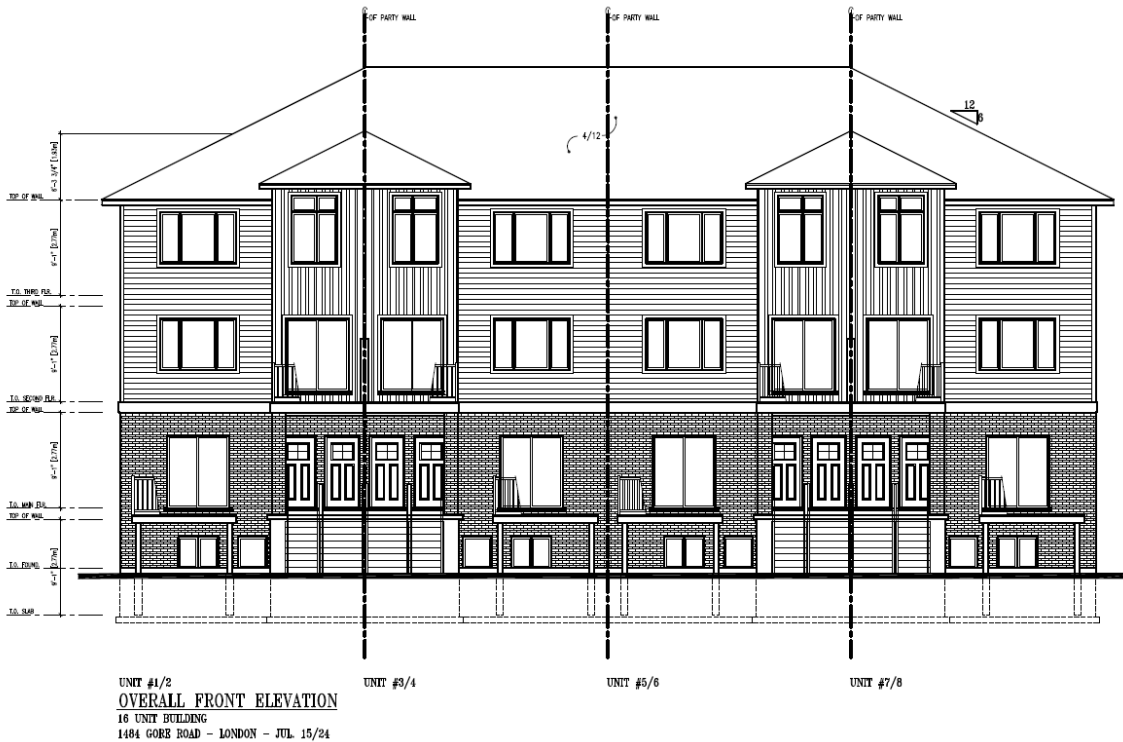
Front elevation for the street-facing stacked townhouses, facing Gore Road
